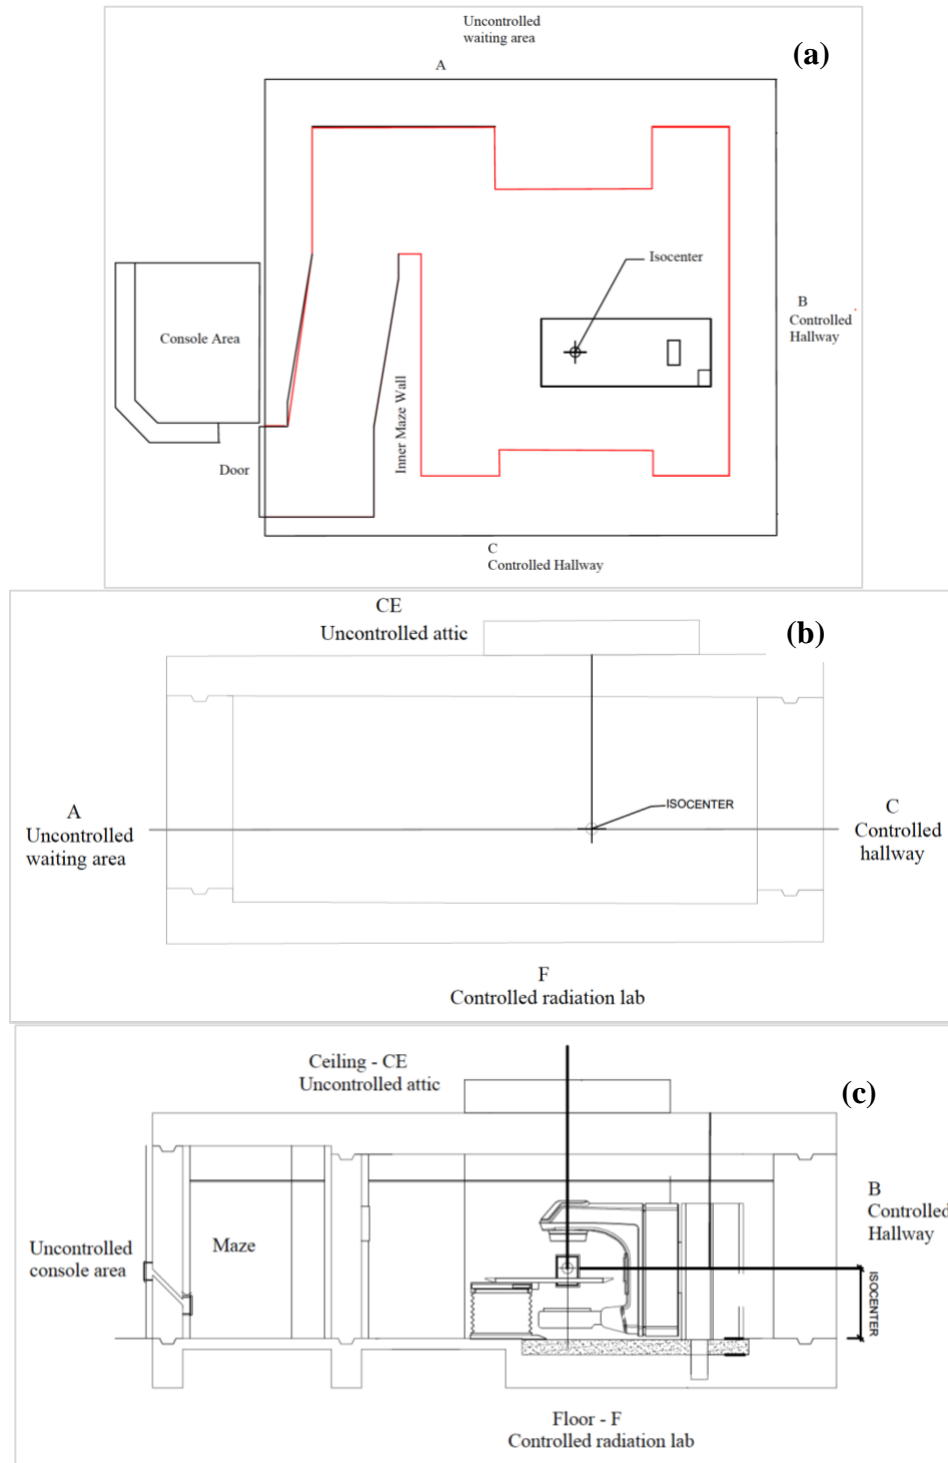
Sample vault floor plan. (a) Top view, (b) front elevation through isocenter in the gantry's plane of rotation, and (c) side elevation through isocenter. This floor plan was based on an existing vault at MBPCC (D. Neck, private communication).
